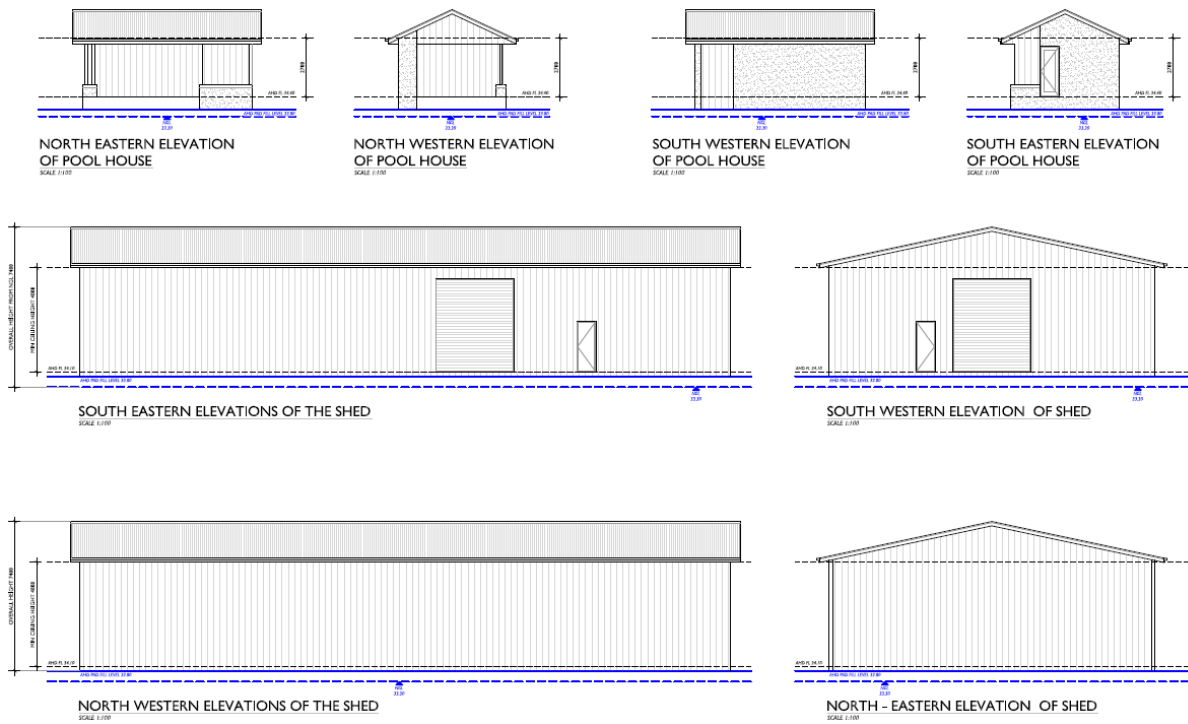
Pool House and Shed Elevations Extract Jackson and Fapio Pty Ltd
